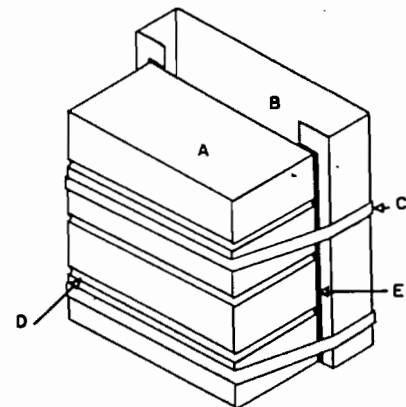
Schematic drawing showing arrangement of metal backing as applied to mortar-brick assemblage. (A) Brick-mortar assemblage, (B) galvanized metal backing container, 2 by 9 by 11 in. with capacity of 3000 ml., (C) galvanized metal strap, (D) mortar joint, and (E) bituminous sealing compound.
